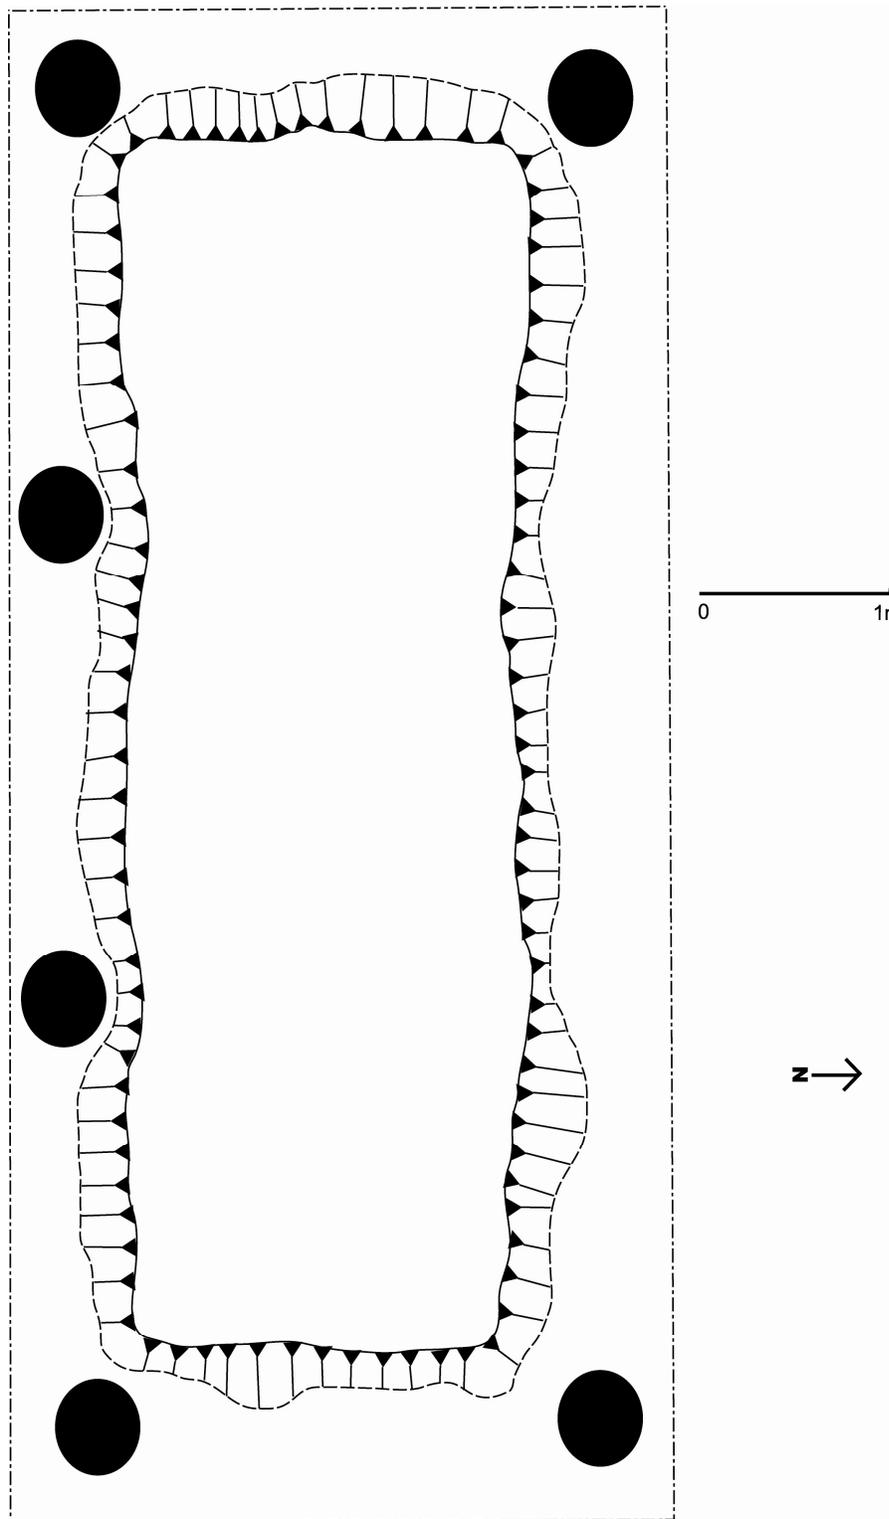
Post excavation plan following excavation of the strip foundations around the piles (shaded black).
